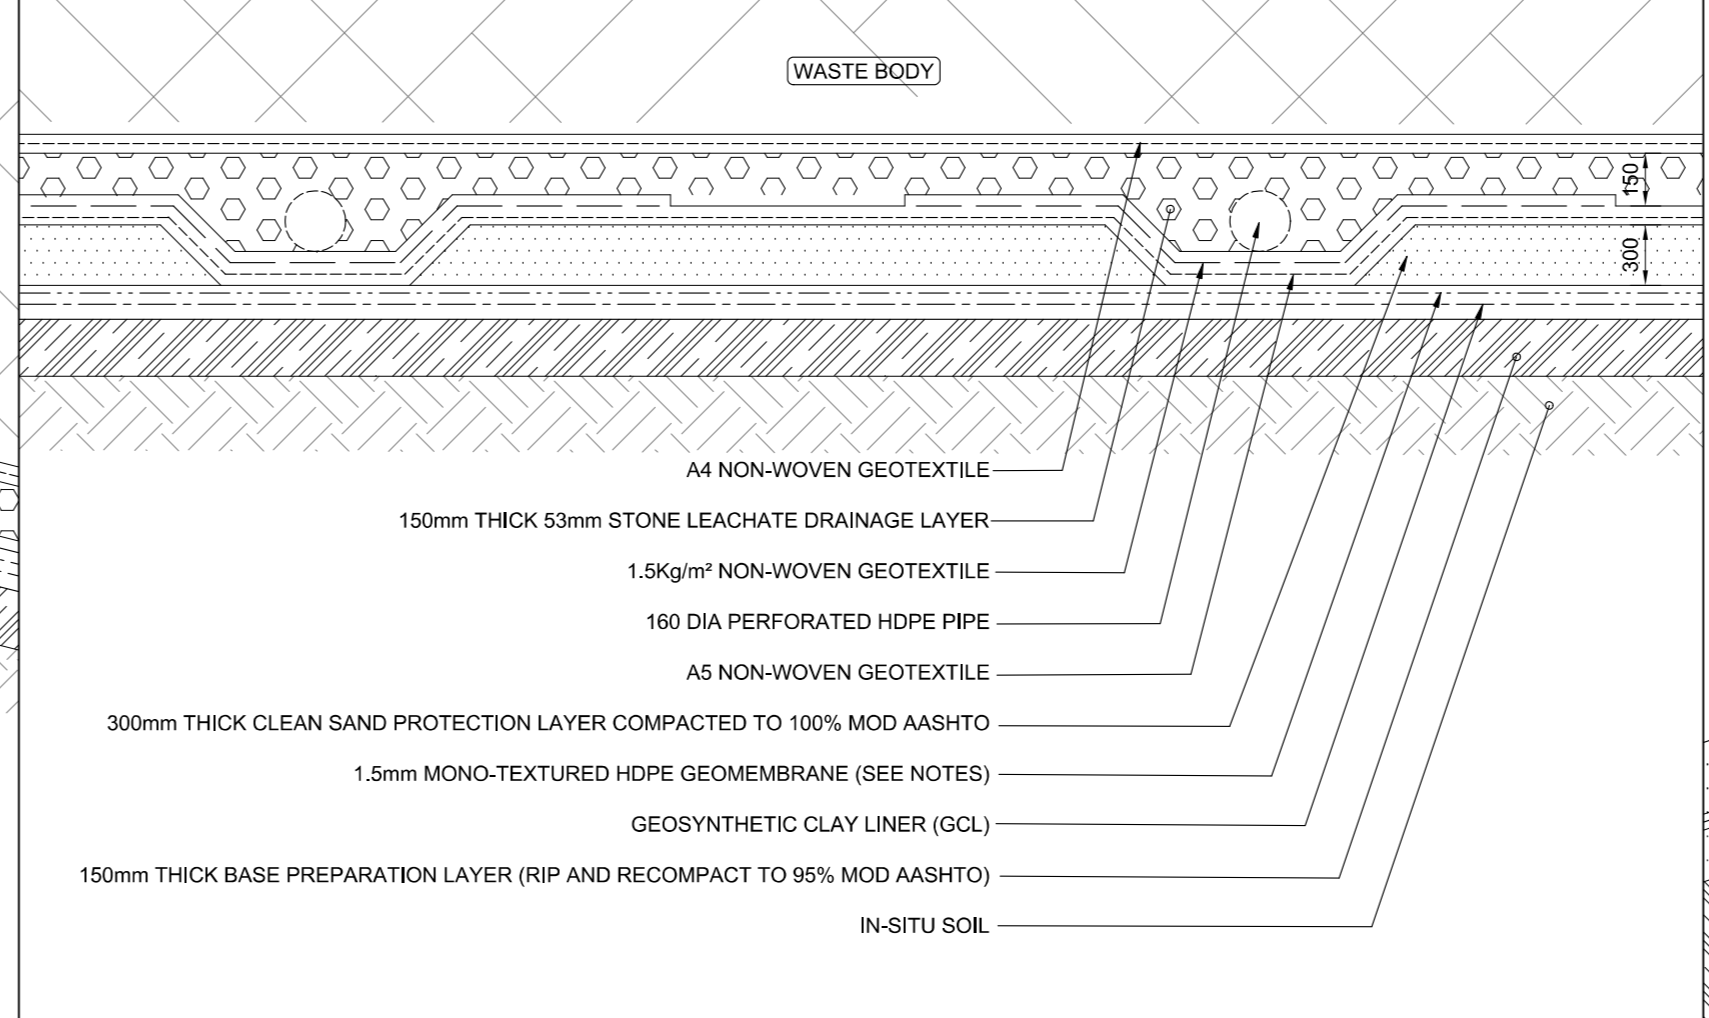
TYPICAL LEACHATE COLLECTION & DETECTION SUMP LAYOUT
